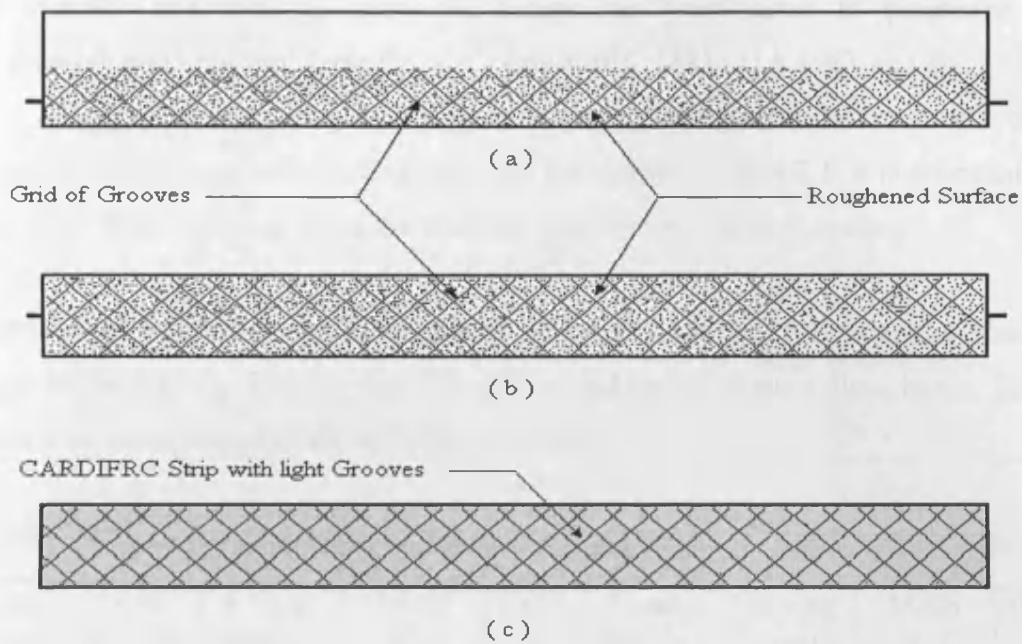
Roughened and grooved beam and strip surfaces (a) Vertical face (b) Tension side and (c) CARDIFRC[®] strip surface
